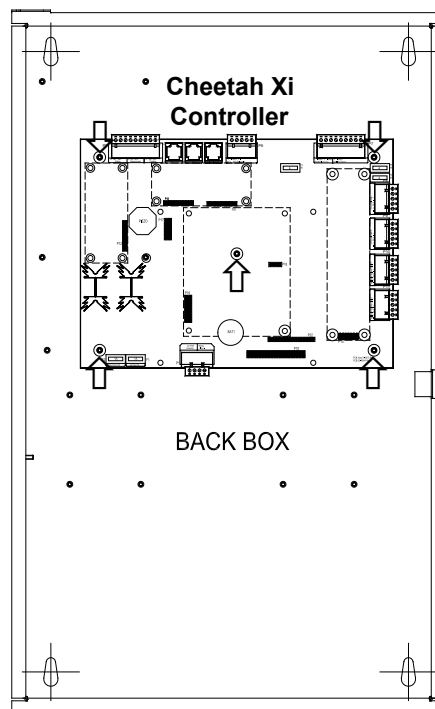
Controller Mounting Location in Standard Enclosure
